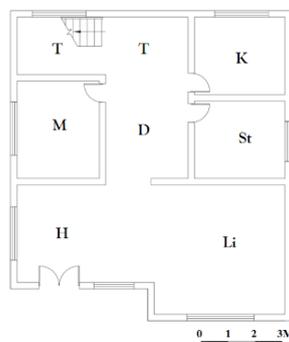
The ground floor plane of QZ-BQ-002 in Quzhou
